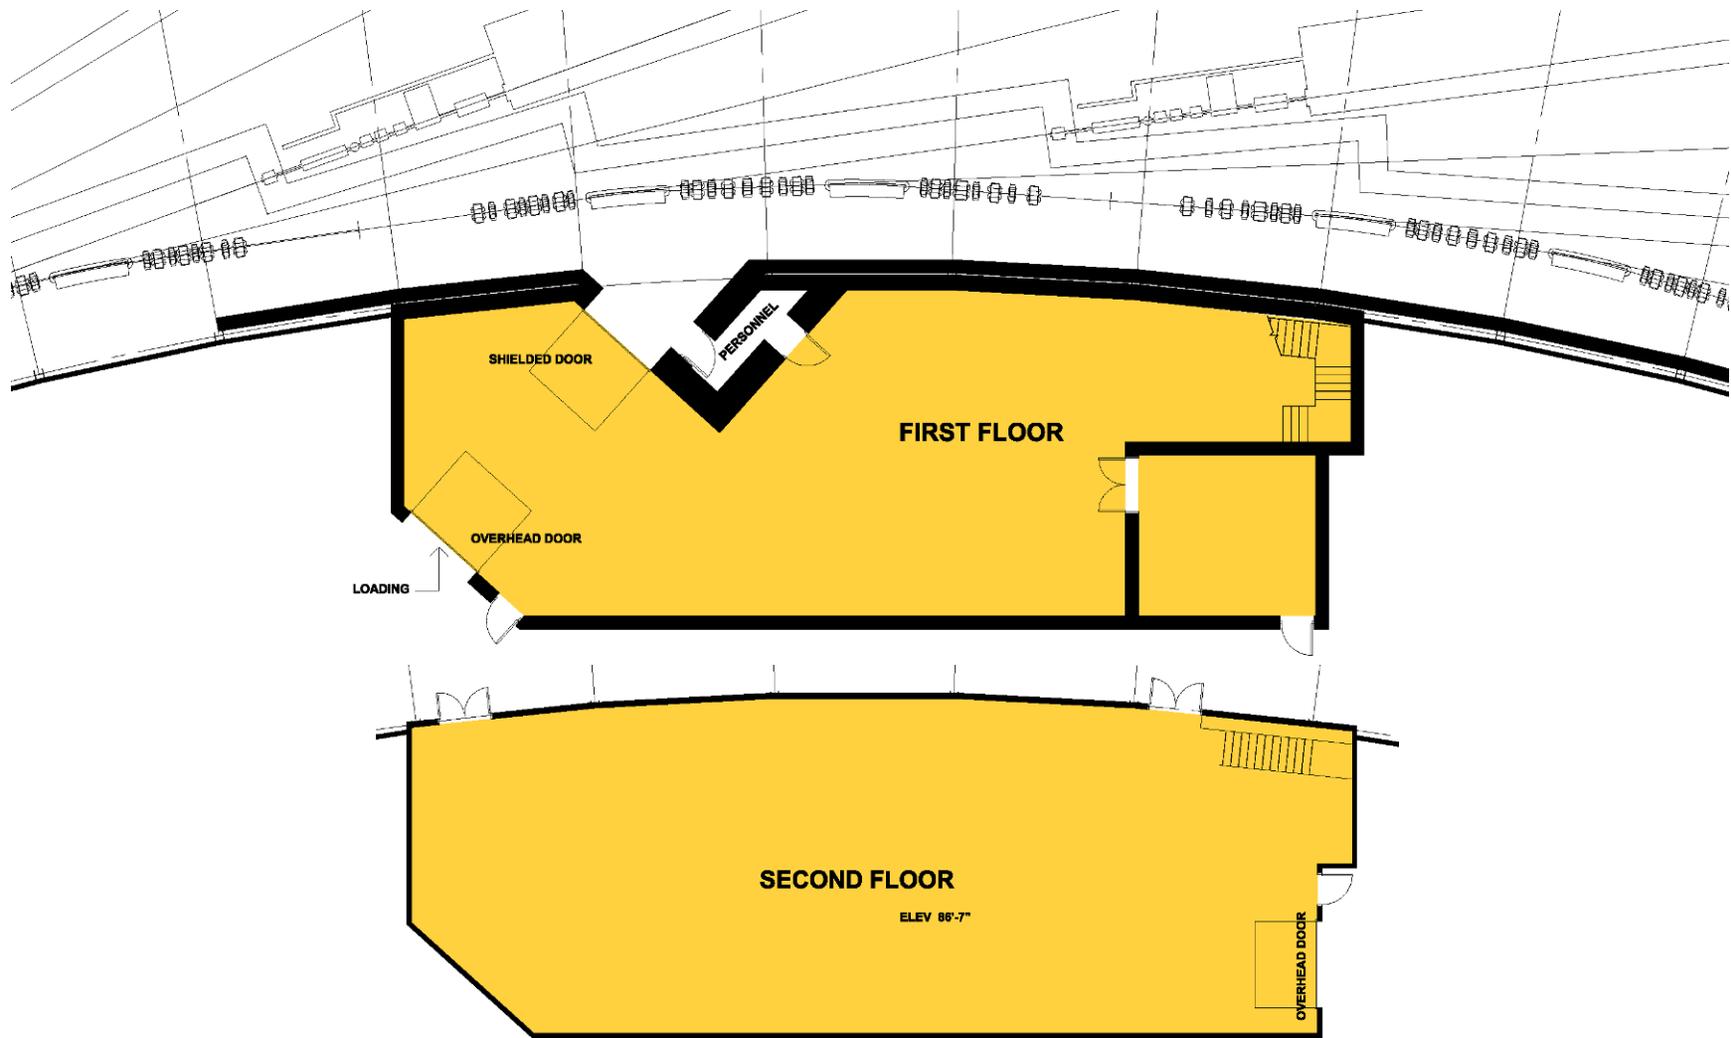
Service Building. Top figure shows first floor and bottom figure shows second floor.
